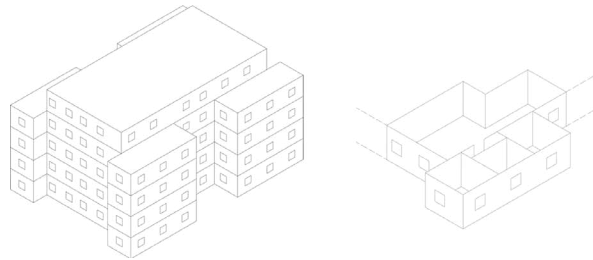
H-building and its typical apartment (Illustrated by the author)
